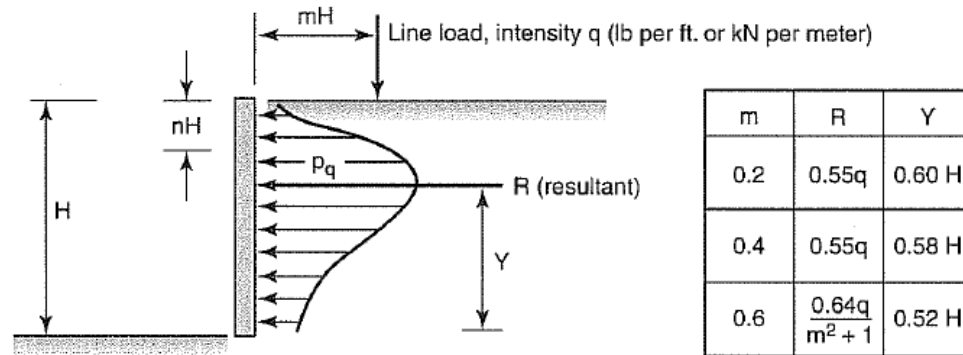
Pressure distribution against vertical wall resulting from line load of intensity q .
